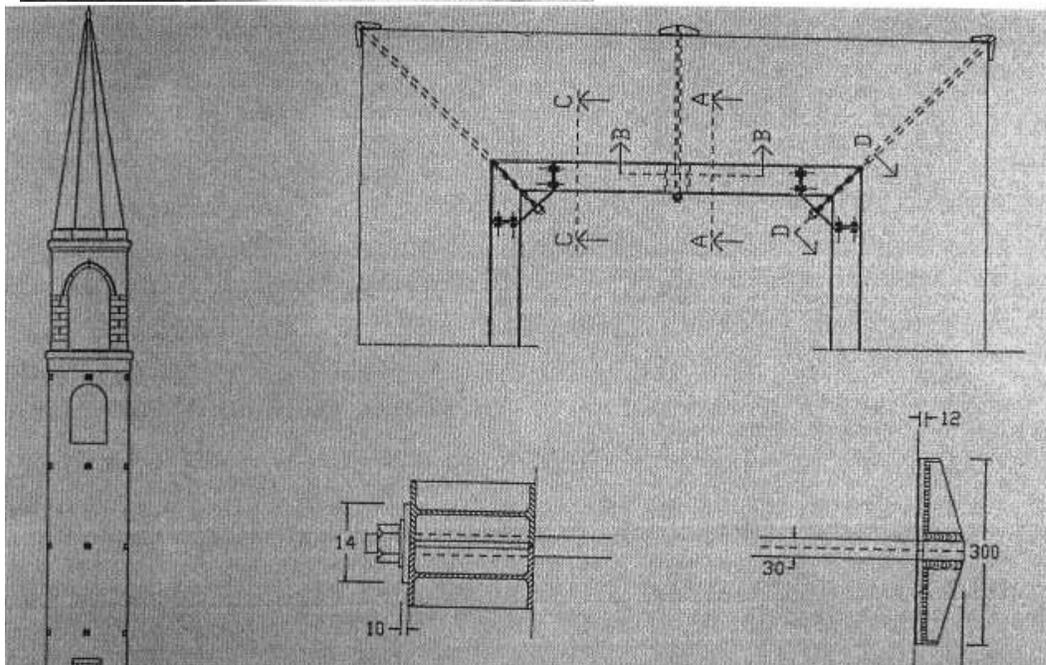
General view and details of the steel work made for strengthening the bell tower.
